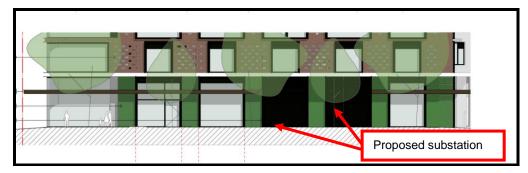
Proposed frontage to Gloucester Road with Substation (Building C (Source: Turner, March 2023)
